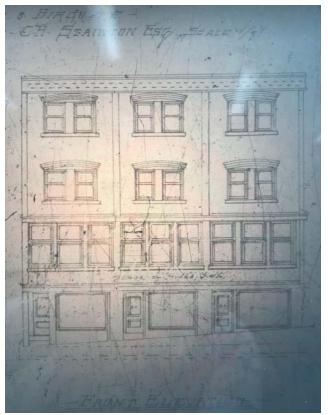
1921 Architectural drawing for new storefronts at 1196-1204 Yonge commissioned by owner C.H. Stainton, architect/builder unknown (Building Records)
